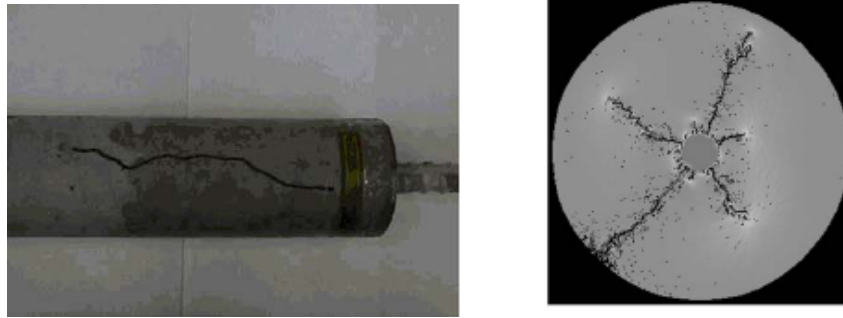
Splitting failure of the concrete cover (Aiello 2001; Wong *et al.*2006)
